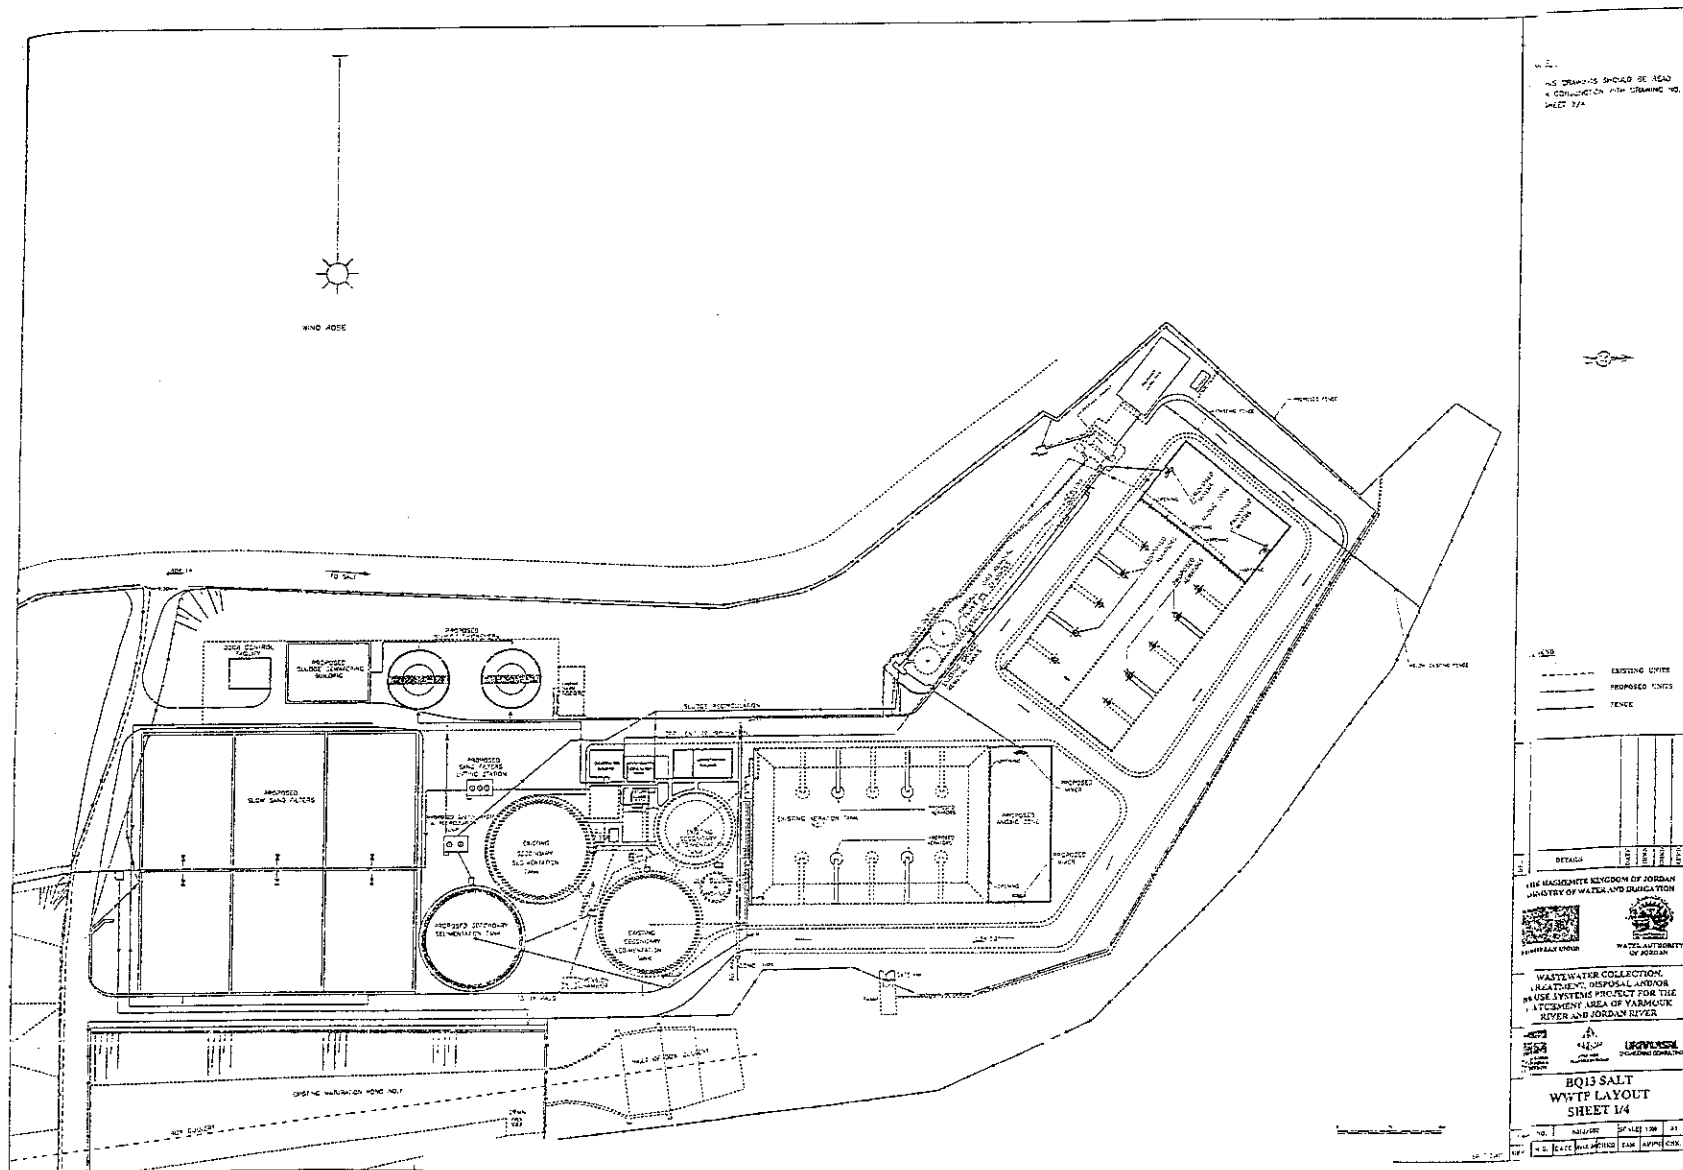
Layout of Proposed Wastewater Treatment Plant - SALT
